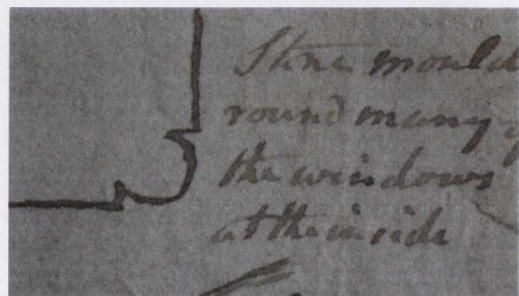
Chepstow Castle, detail, 'stone moulding round many of the windows at the inside', Laurence Parsons, n.d., Rosse papers, O/14/5.
